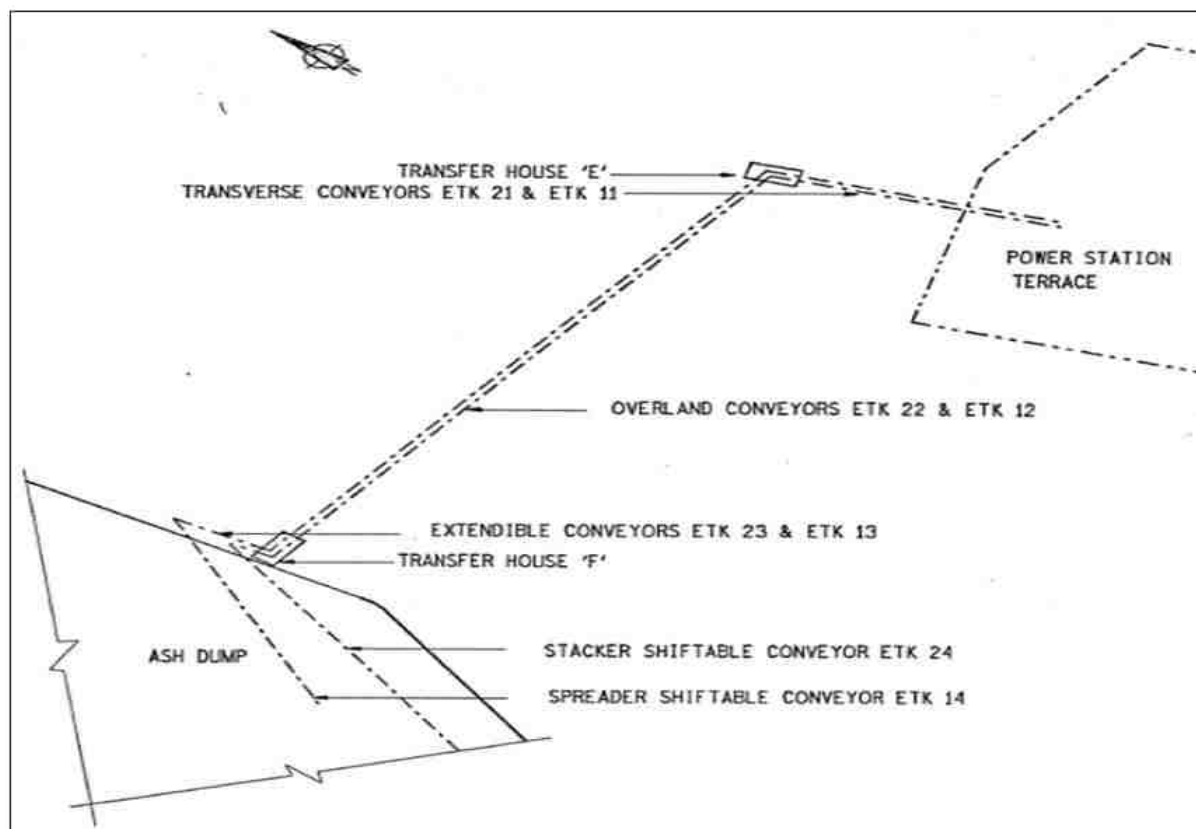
Schematic Layout of conveyor system used to deposit ash
